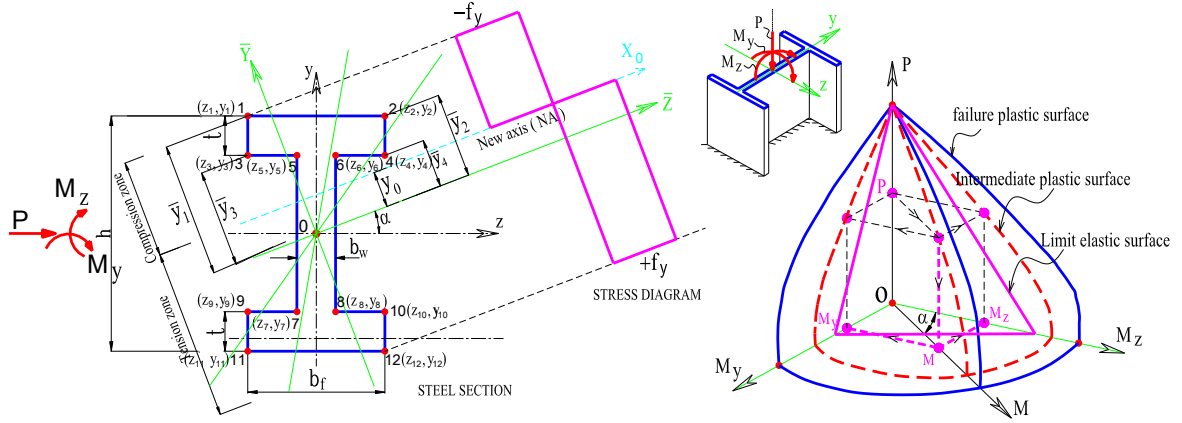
Steel section column, stress diagram and plastic surface of I steel section column
